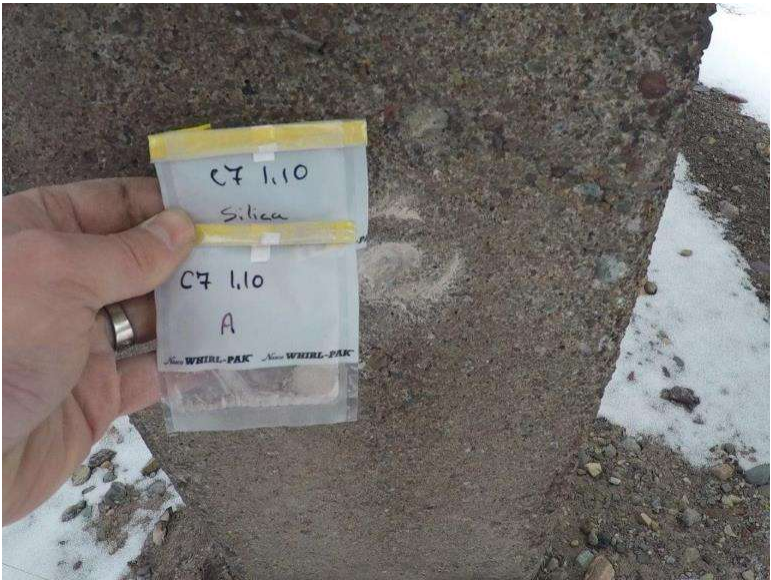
Site 1.10 Crandell Campground 129 Campsites (Loop B Campsite 13)
